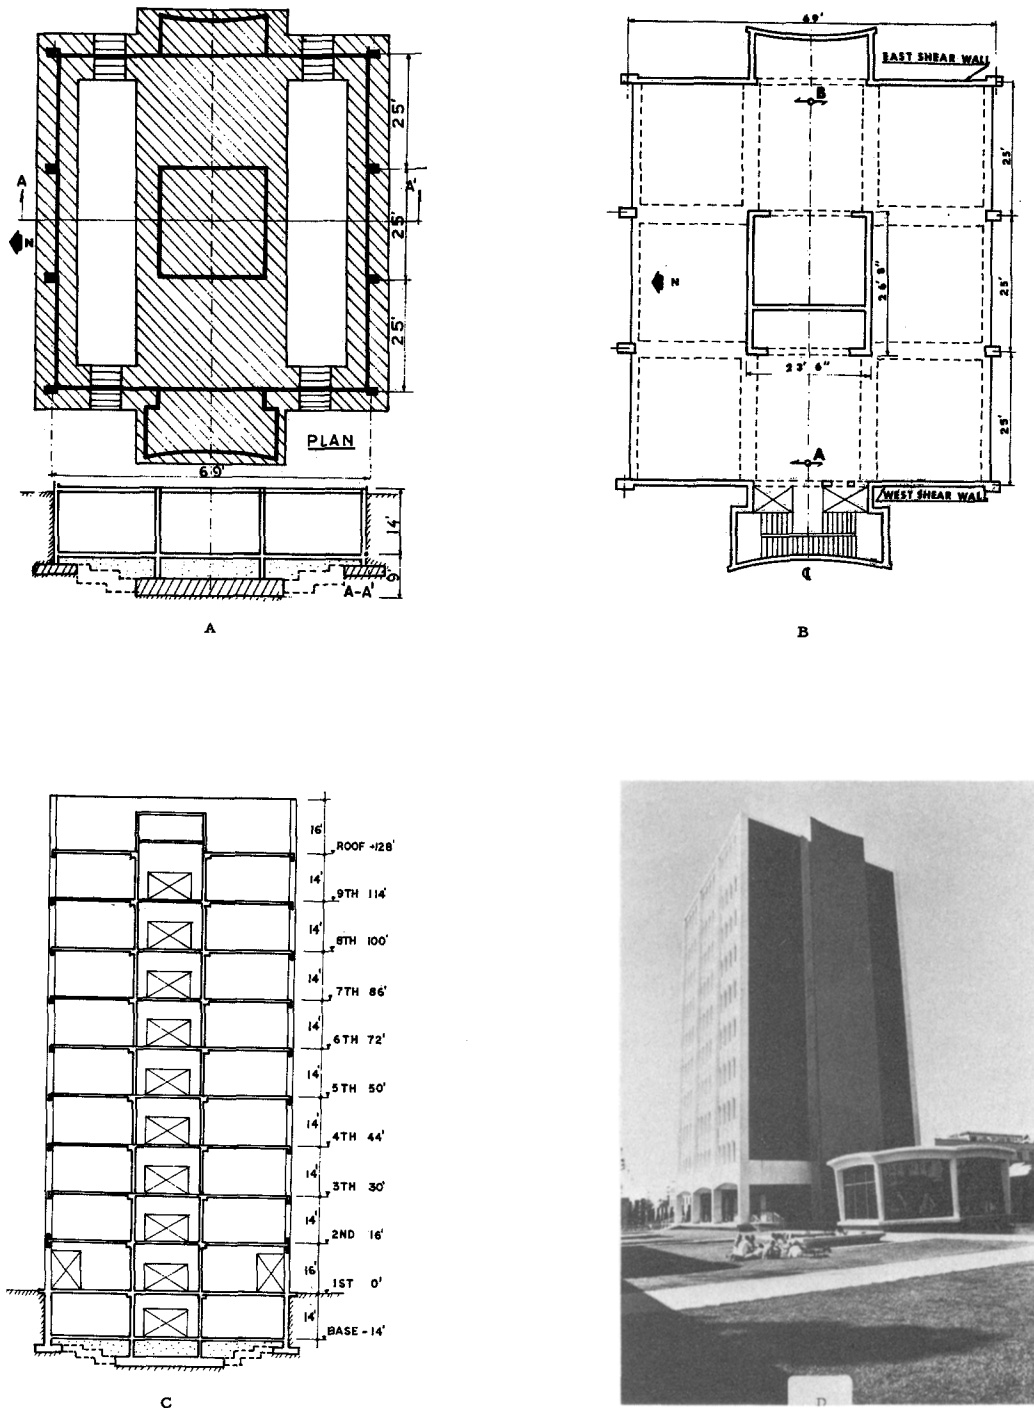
Millikan Library Building: (a) foundation plan and N-S section; (b) typical floor plan; (c) N-S section; (d) view of building looking Northwest.
